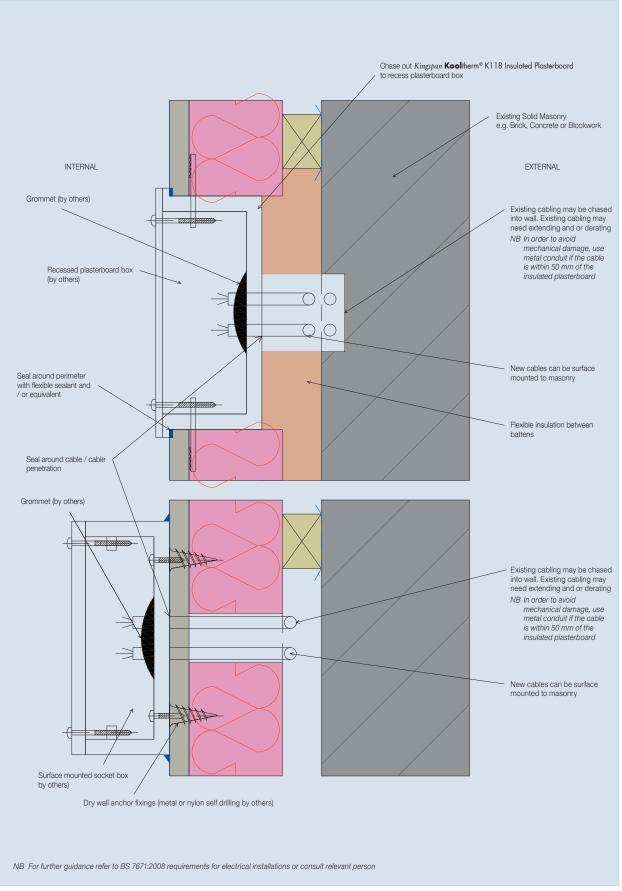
Recessed or Surface Mounted Socket Detail (Mechanically Fixed)
